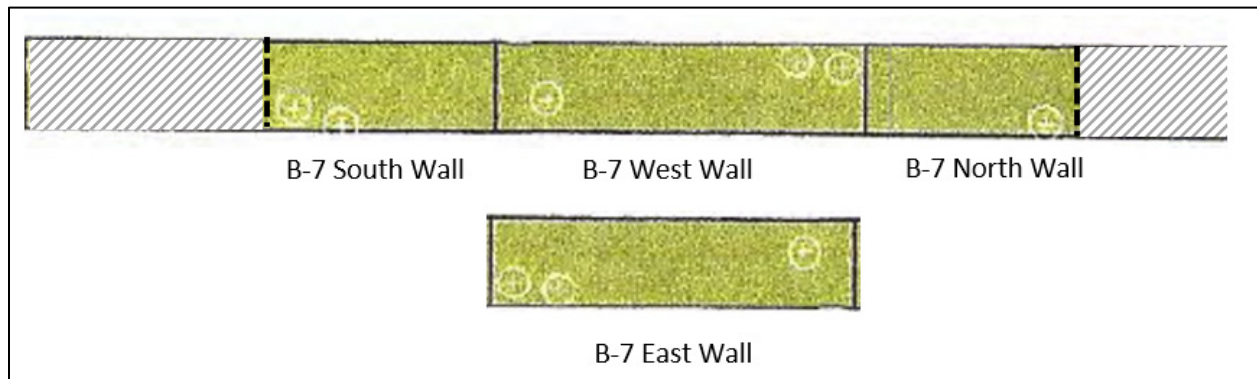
Room B-7 ACS Wall Survey Measurement Locations
